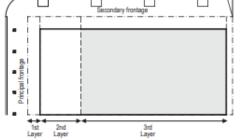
Building Form exhibit from the Central US 1 Corridor Sector Plan
